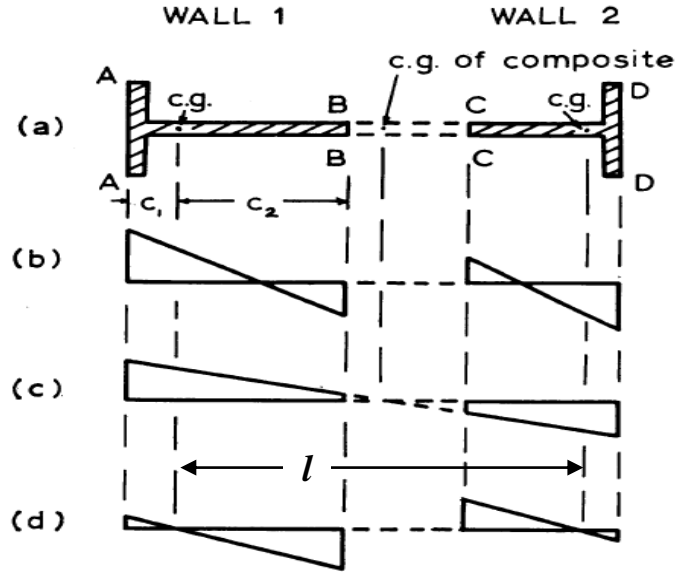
Plan of walls with stress distribution (Coull and Choudhury 1967a)
